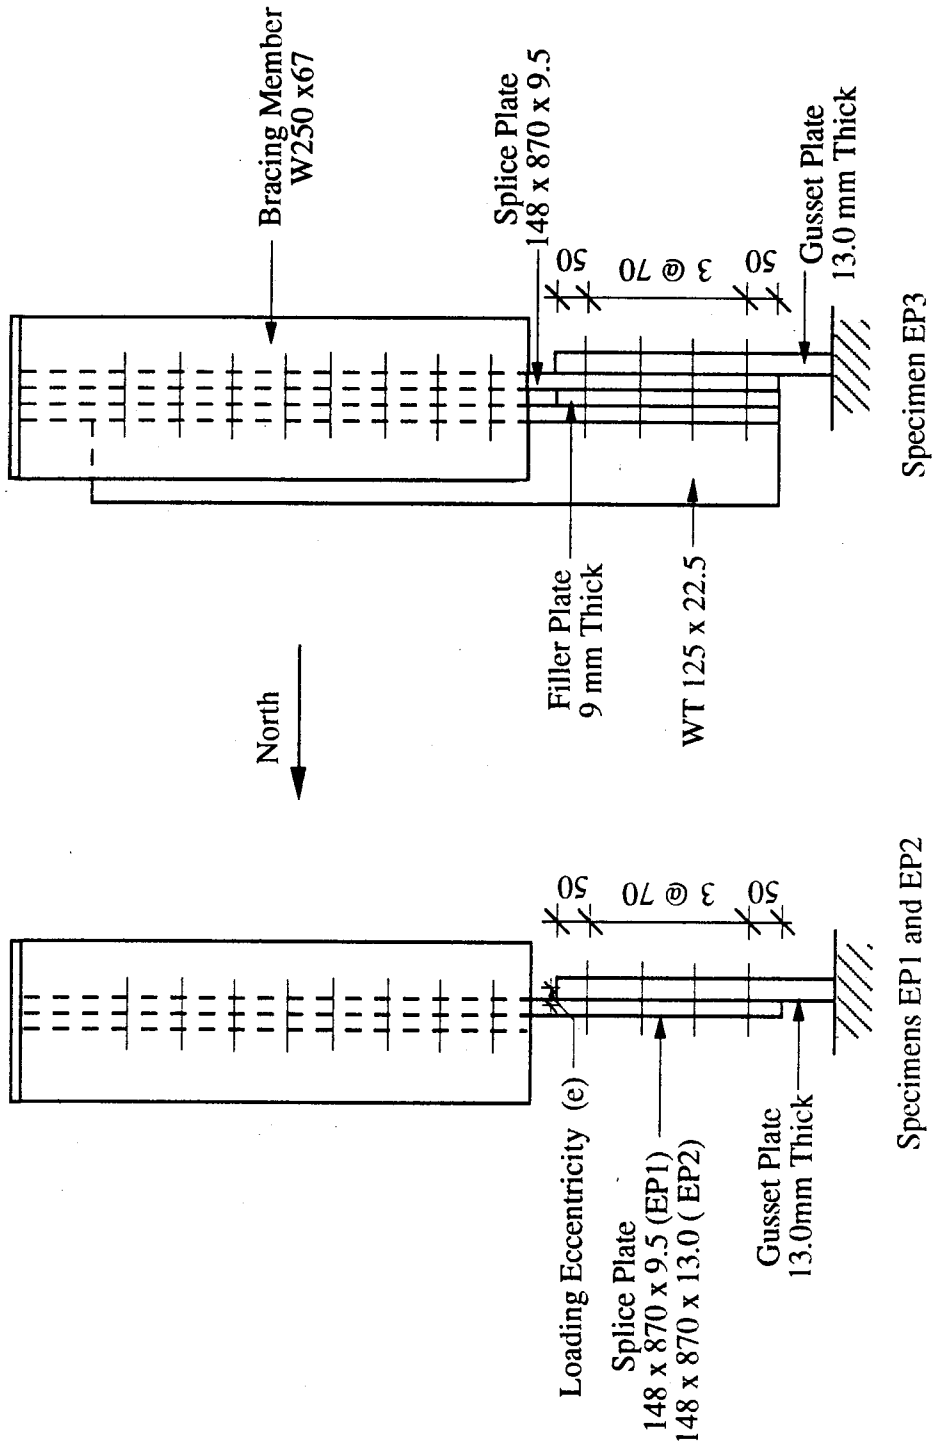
Splice Member Arrangement for EP Type Specimens
